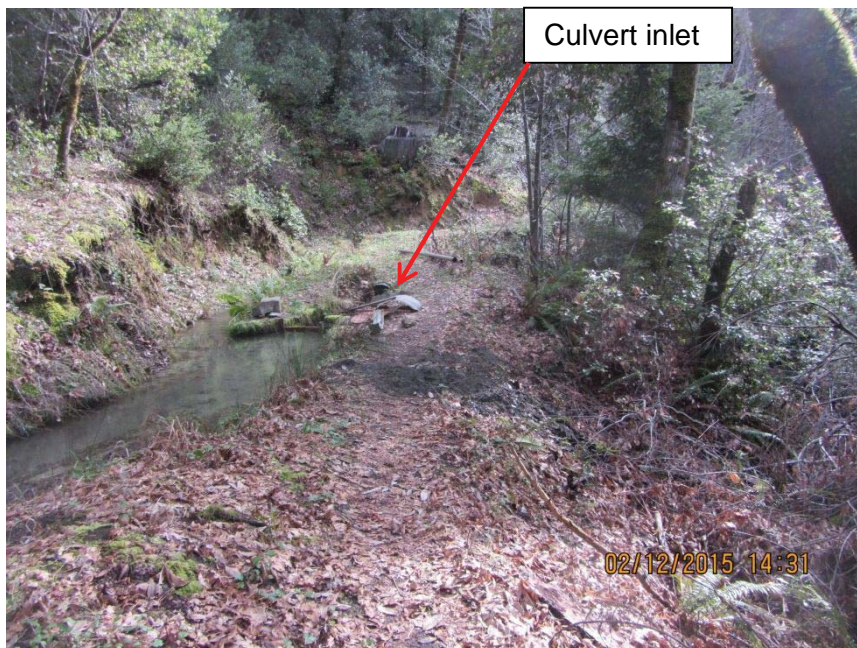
at Point 4, shows the partial diversion of the ditch into an unnamed tributary to Stanshaw Creek through the inlet of a 12-inch culvert, before the diversion ditch is routed across the stream in a lined ditch. The culvert is shotgunned, which appears to have caused significant instream erosion in the downslope channel. The stream above the crossing is 3-4 feet wide at bankfull width; the eroded stream channel below the diversion crossing is 12-14 feet wide, and does not appear stable. At this location, I also observed muddy soils in the berm adjacent to the ditch, indicating that seepage from the ditch is saturating surrounding soils, which may lead to catastrophic failure of the ditch. (Photo 8441)
